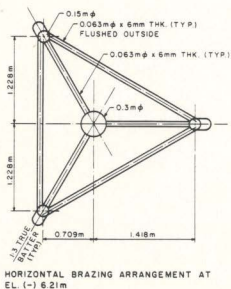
The fabrication drawing describing the horizontal bracing for the tower
